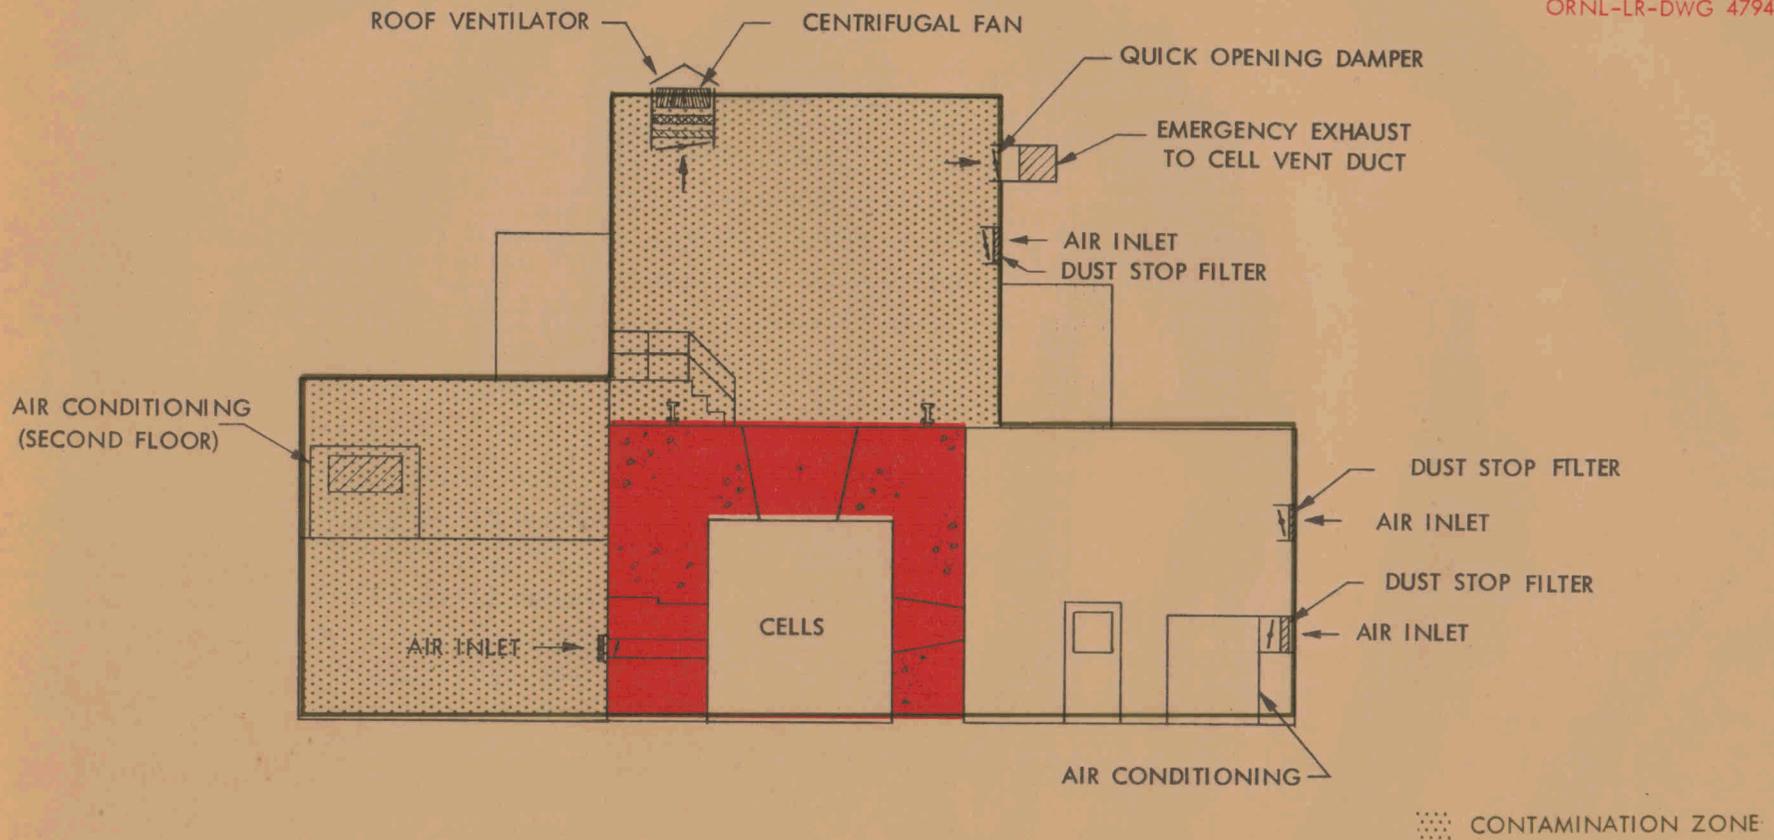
BUILDING 4507 SECTION VIEW VENTILATION SCHEMATIC
